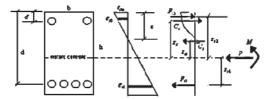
The Cross-Section with Two Layers of Reinforcing Bars
